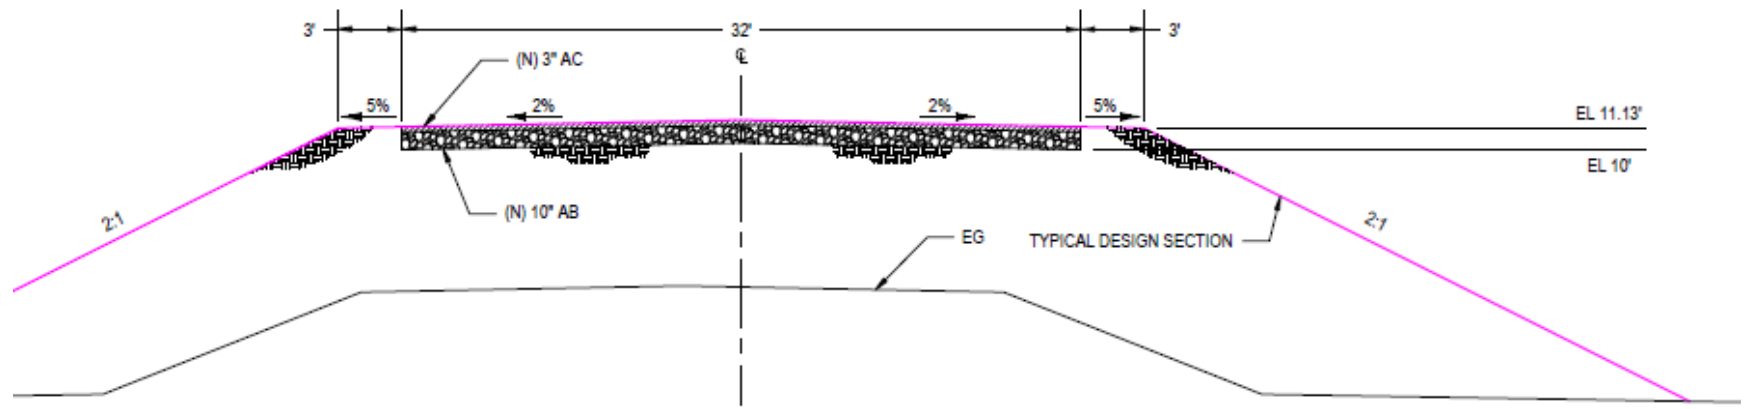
Typical Raised Road Section along Walnut Grove-Thornton Road in RD 563 (Kjeldsen, Sinnock, and Neudeck, 2020b)
